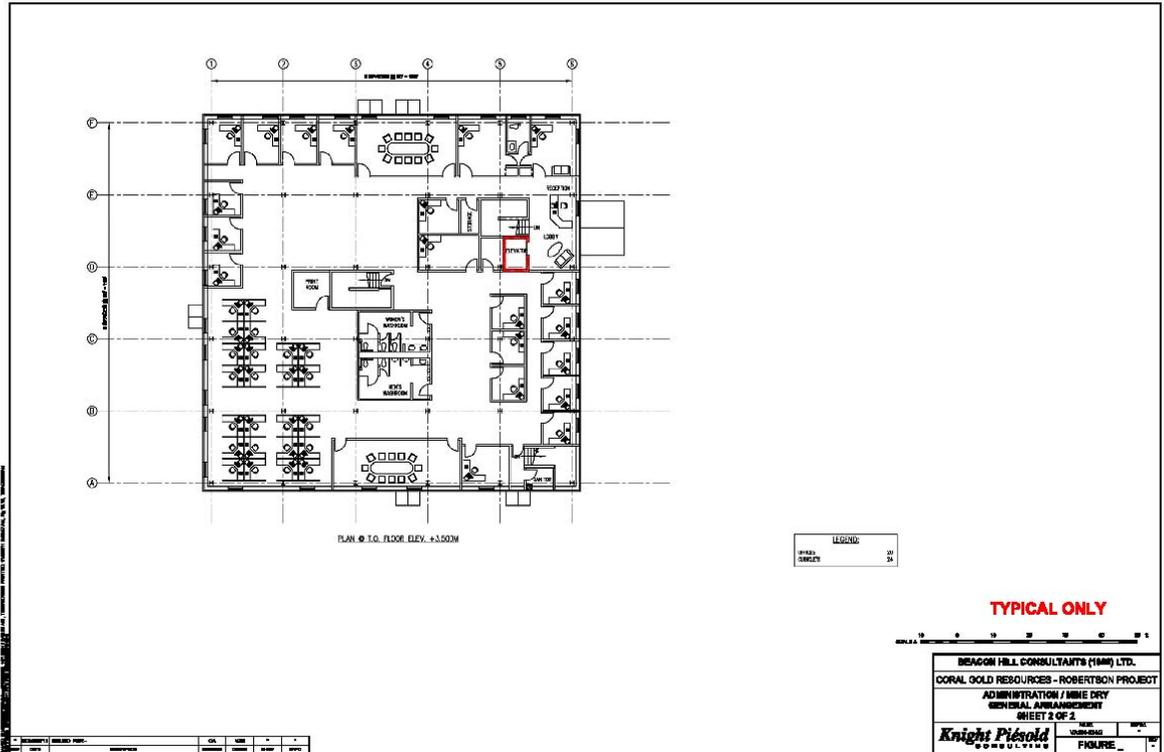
Administration / Mine Dry – General Arrangement Plan (Sheet 2 of 2)
